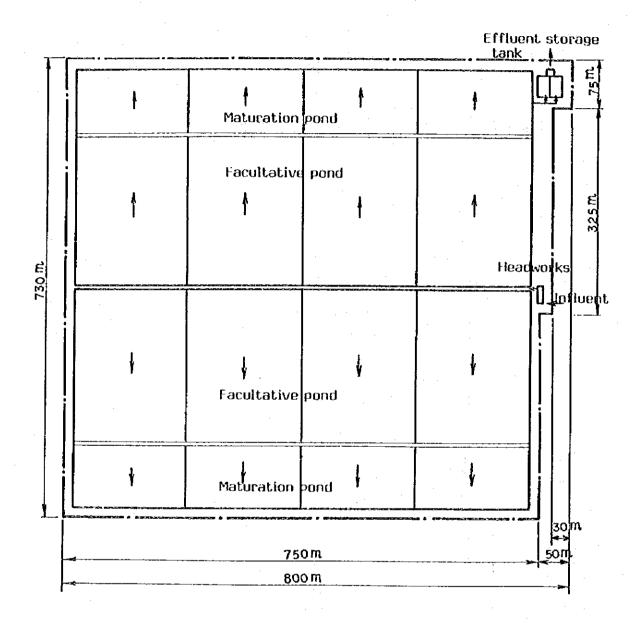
Layout Plan of Oxidation Pond Plant
